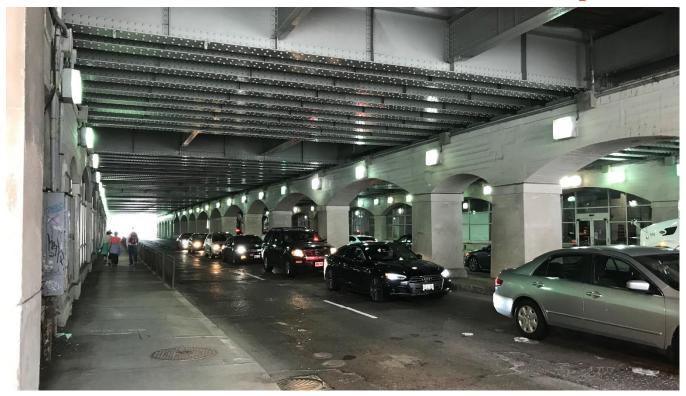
Centre set of columns with segmentally arched openings located on York Street
